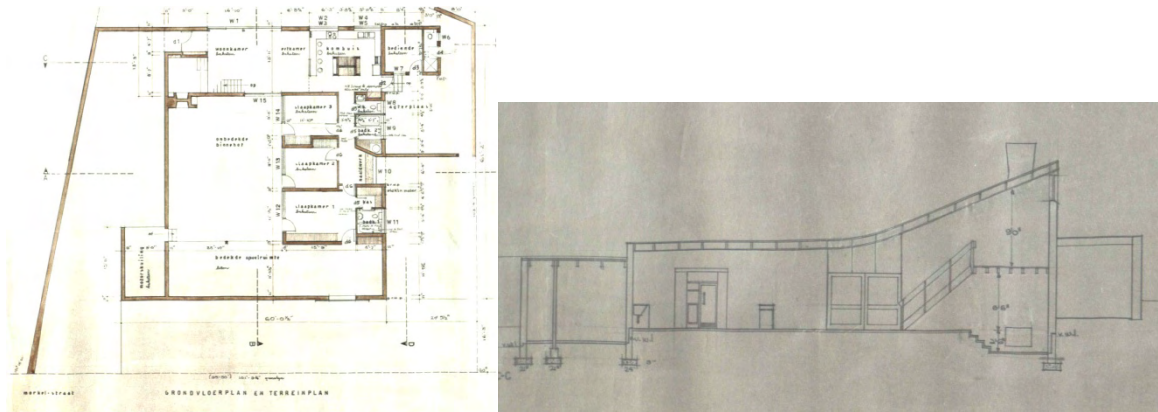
Left: Plan of House Patterson (1966) (Fagan archive - Job No. 655, undated). Right: Section through House Patterson (1966) (Fagan archive - Job No. 655, undated).
